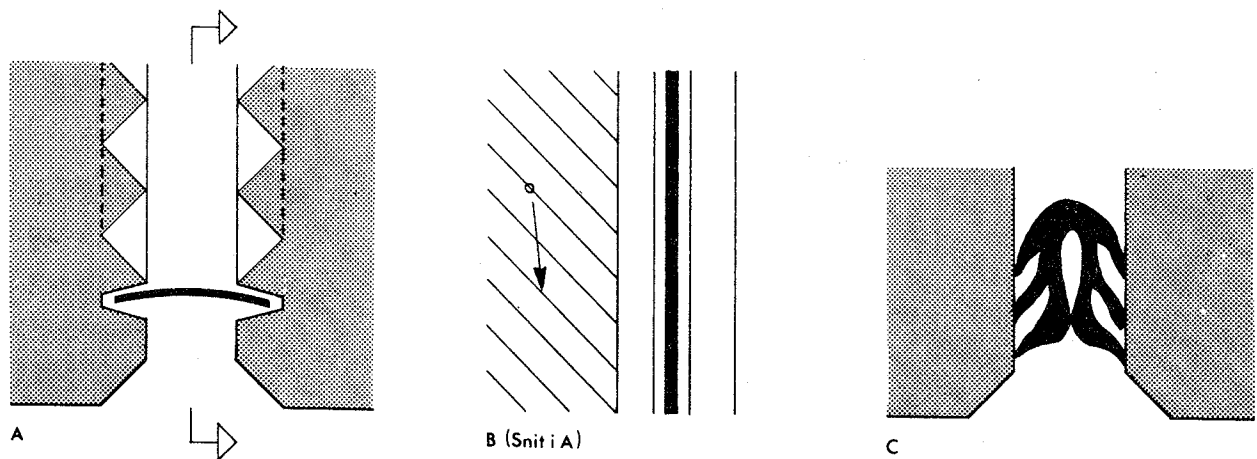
Baffles in Two-Stage, Open, Ventilated, Vertical Joints between Concrete Facade Components.
